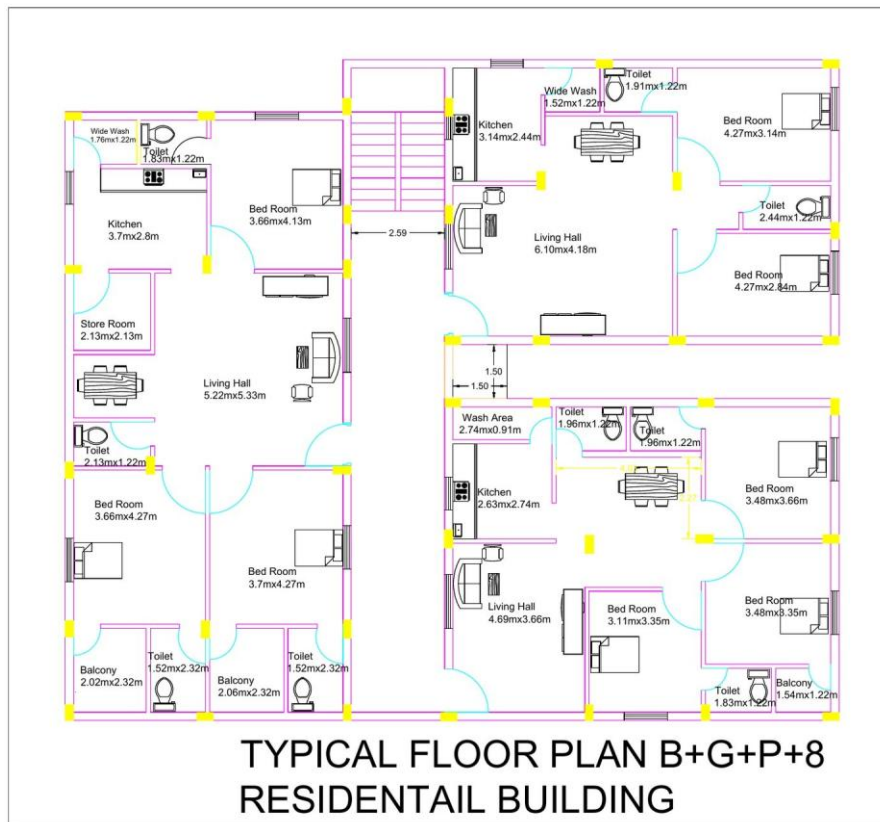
Typical floor plan of the B+G+P+8 residential building.
